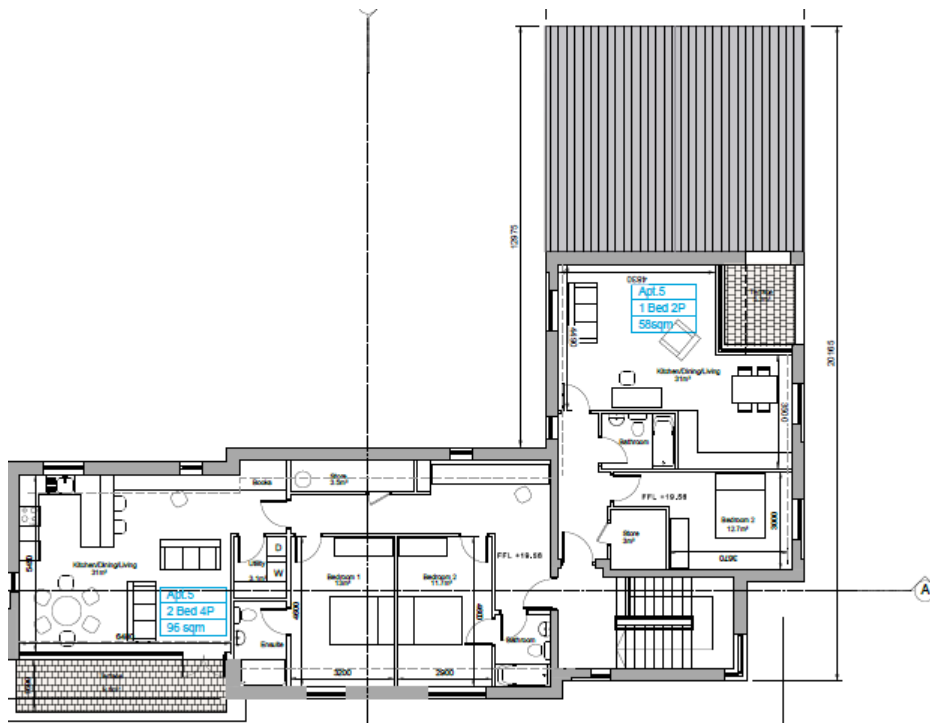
Duplex Apartment Block 1 Second Floor layout to be analysed using ADF method
